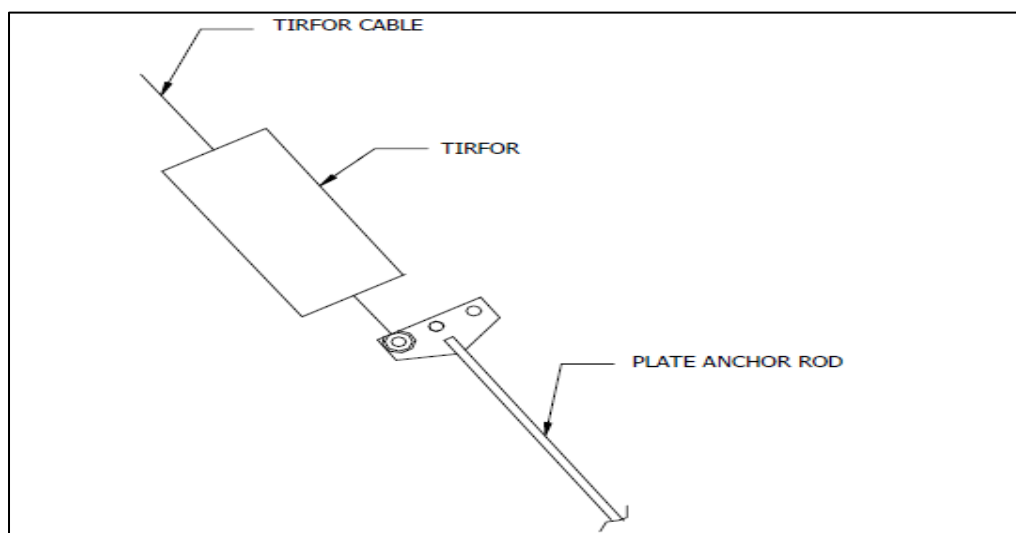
Detail of installation of temporary guy on the permanent anchor
